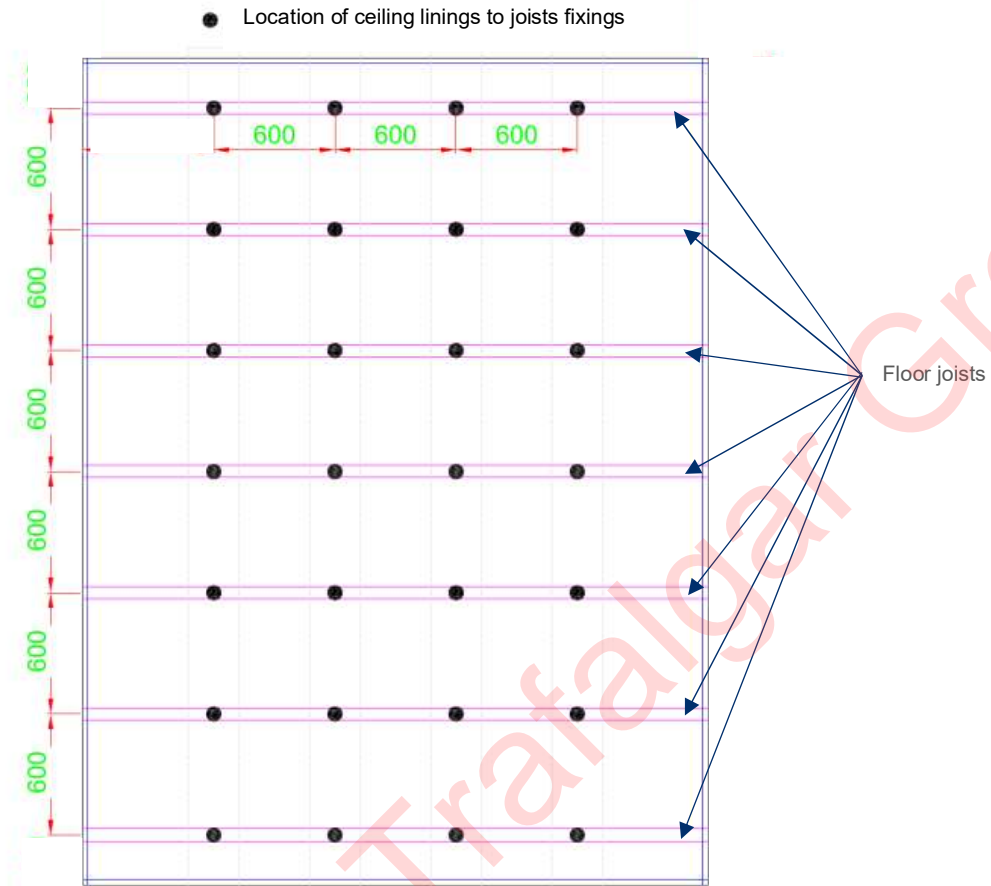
A1 COREX ceiling linings to floor joists fixing locations
